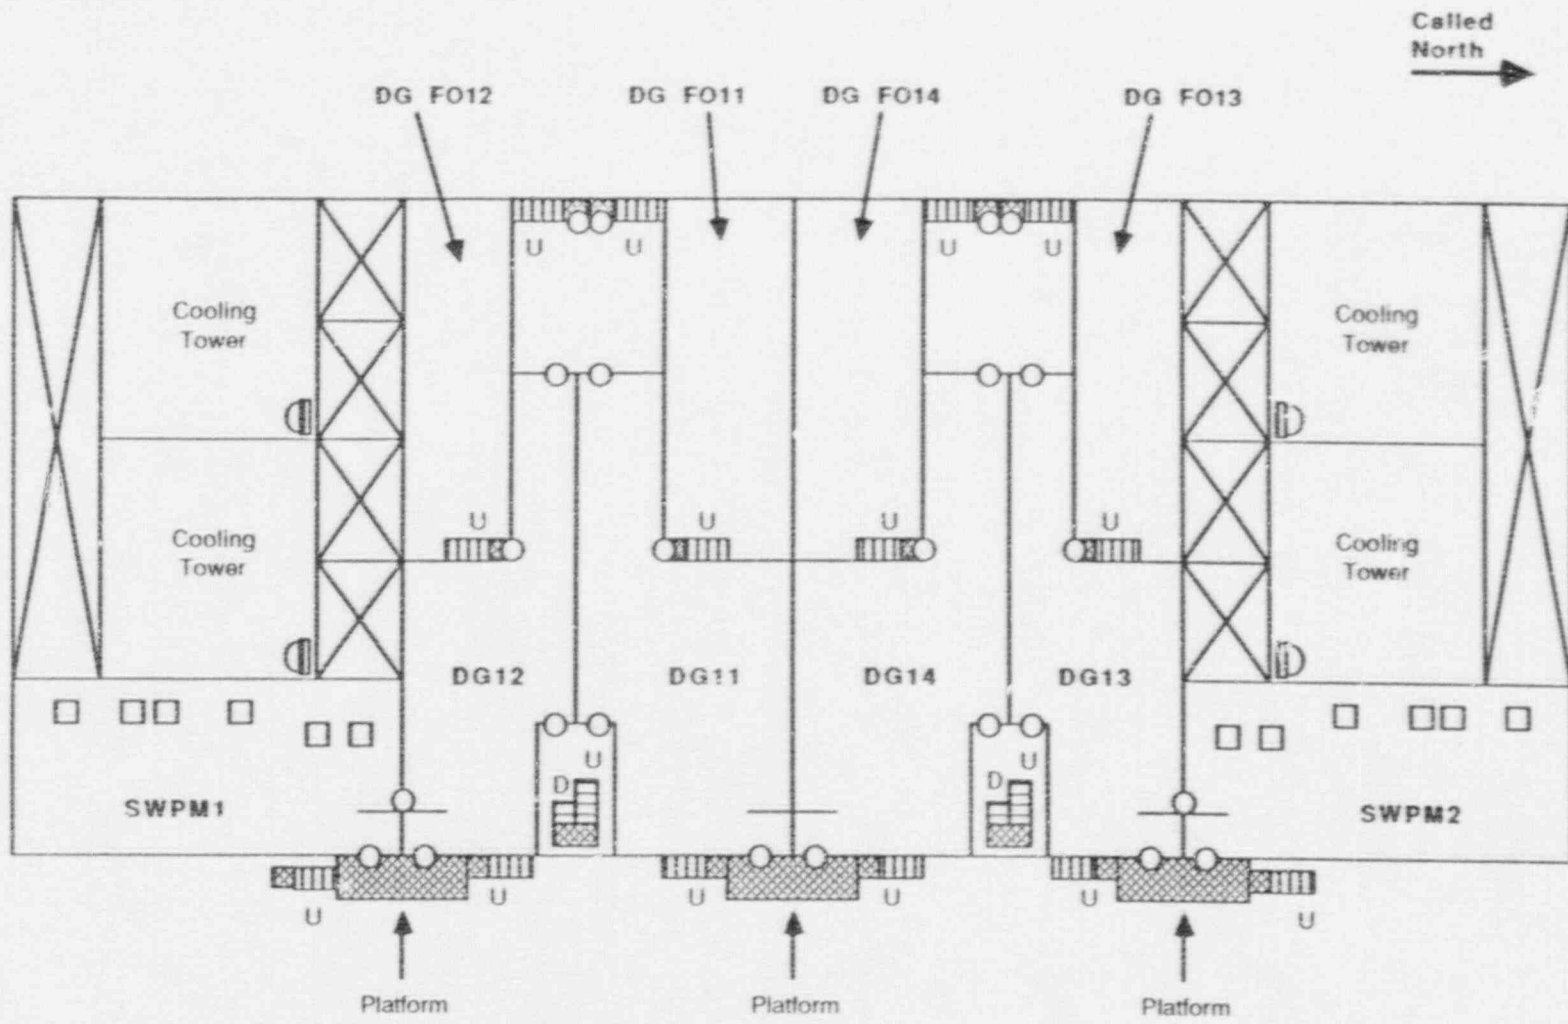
Enrico Fermi Unit 2 - RHR Complex Arrangement Grade Elevation
